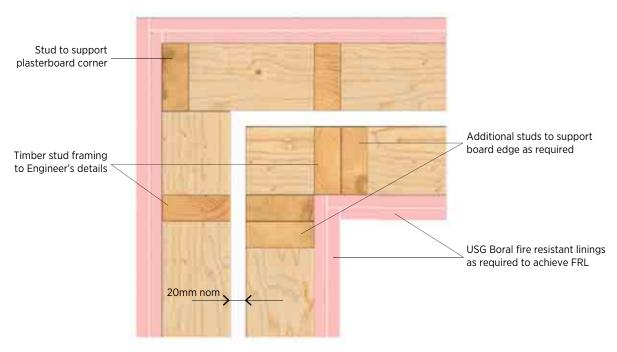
Twin Timber Stud Wall - Corner Junction Detail
